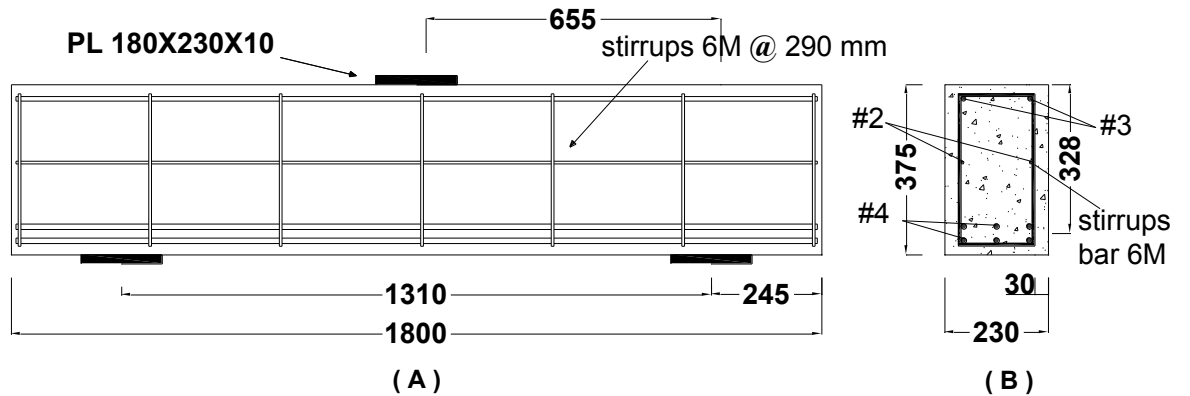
Beam C2/75: (A) elevation (B) cross section
